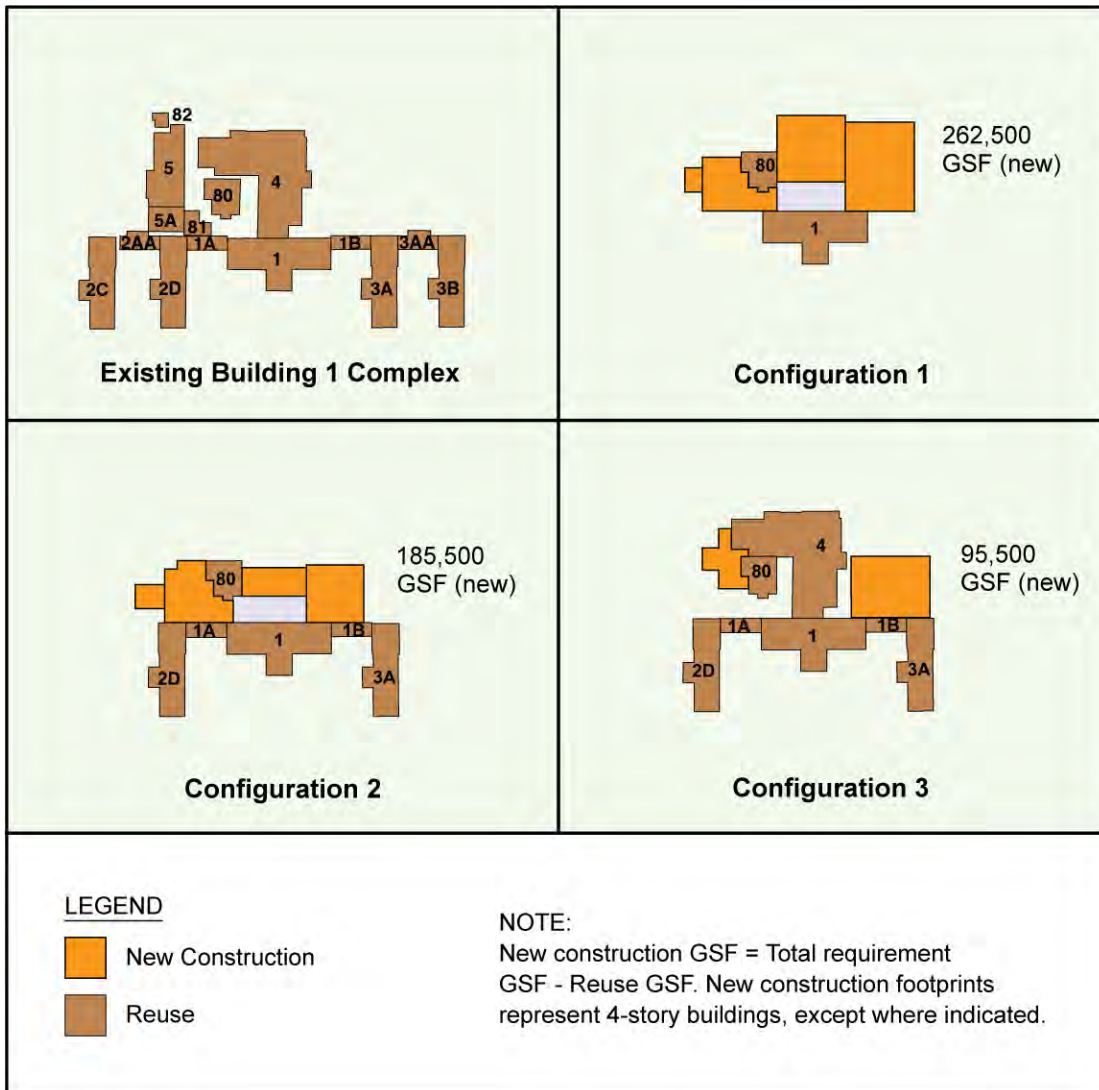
Existing Building 1 Complex and Configurations 1, 2, and 3
